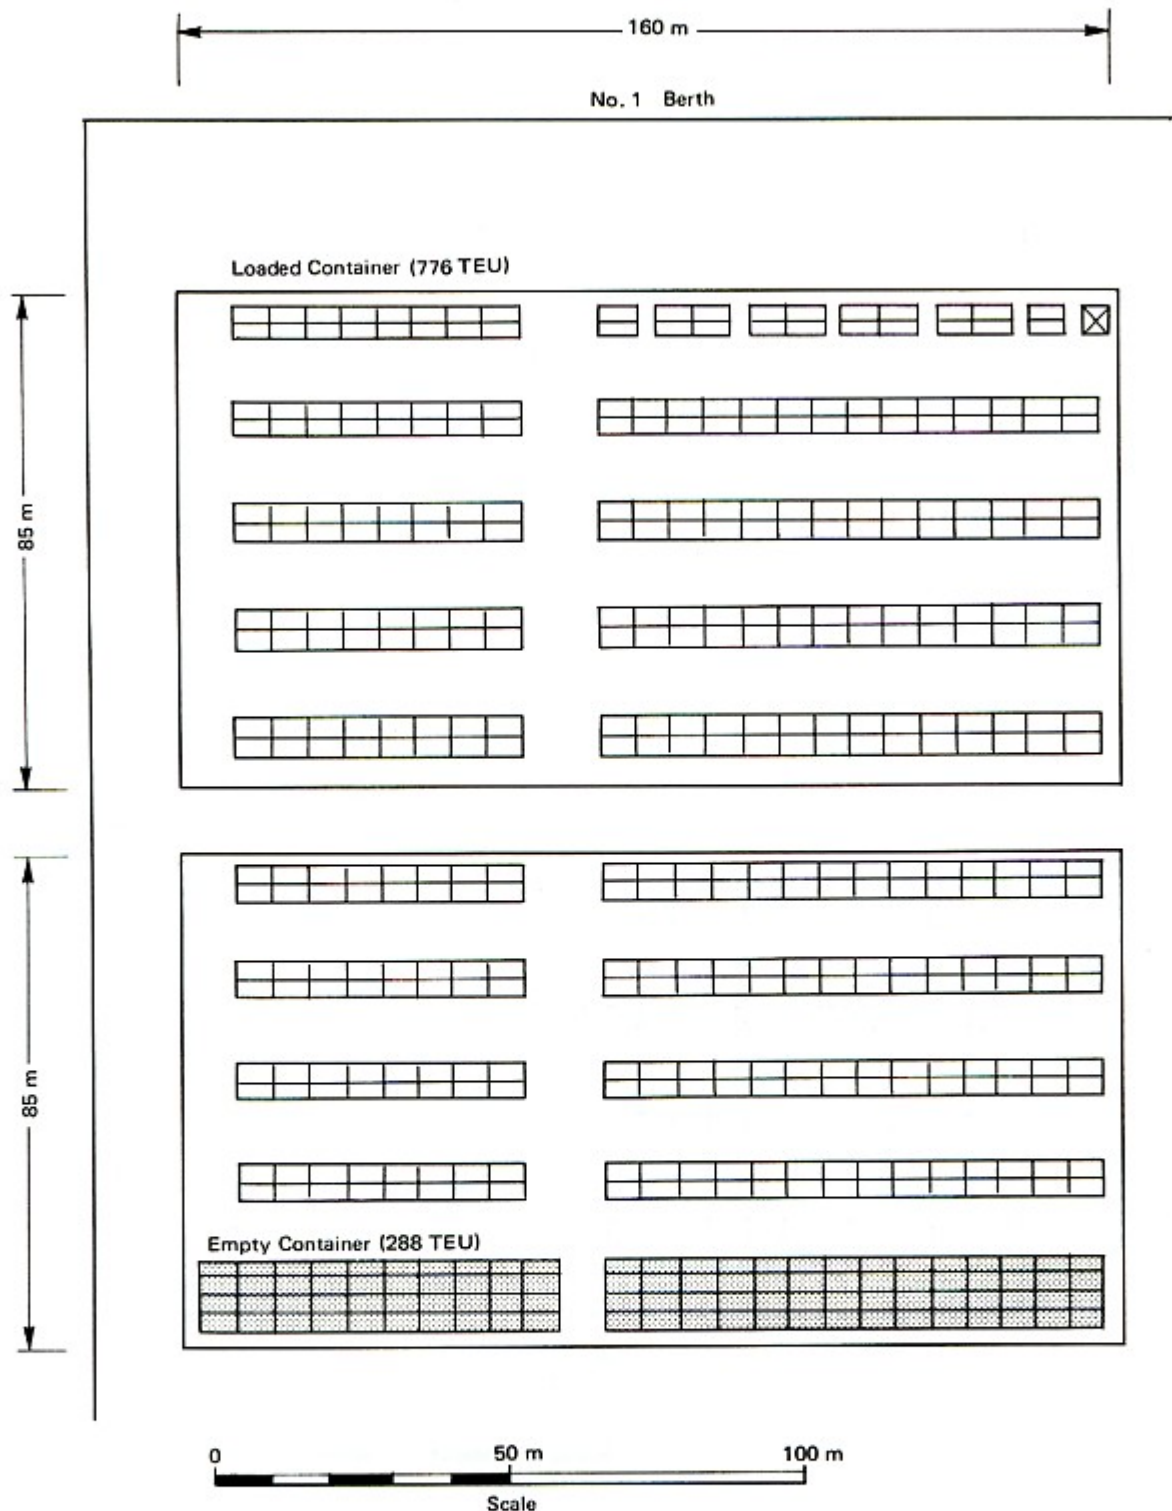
(a) Container Yard Slot Arrangement Plan
